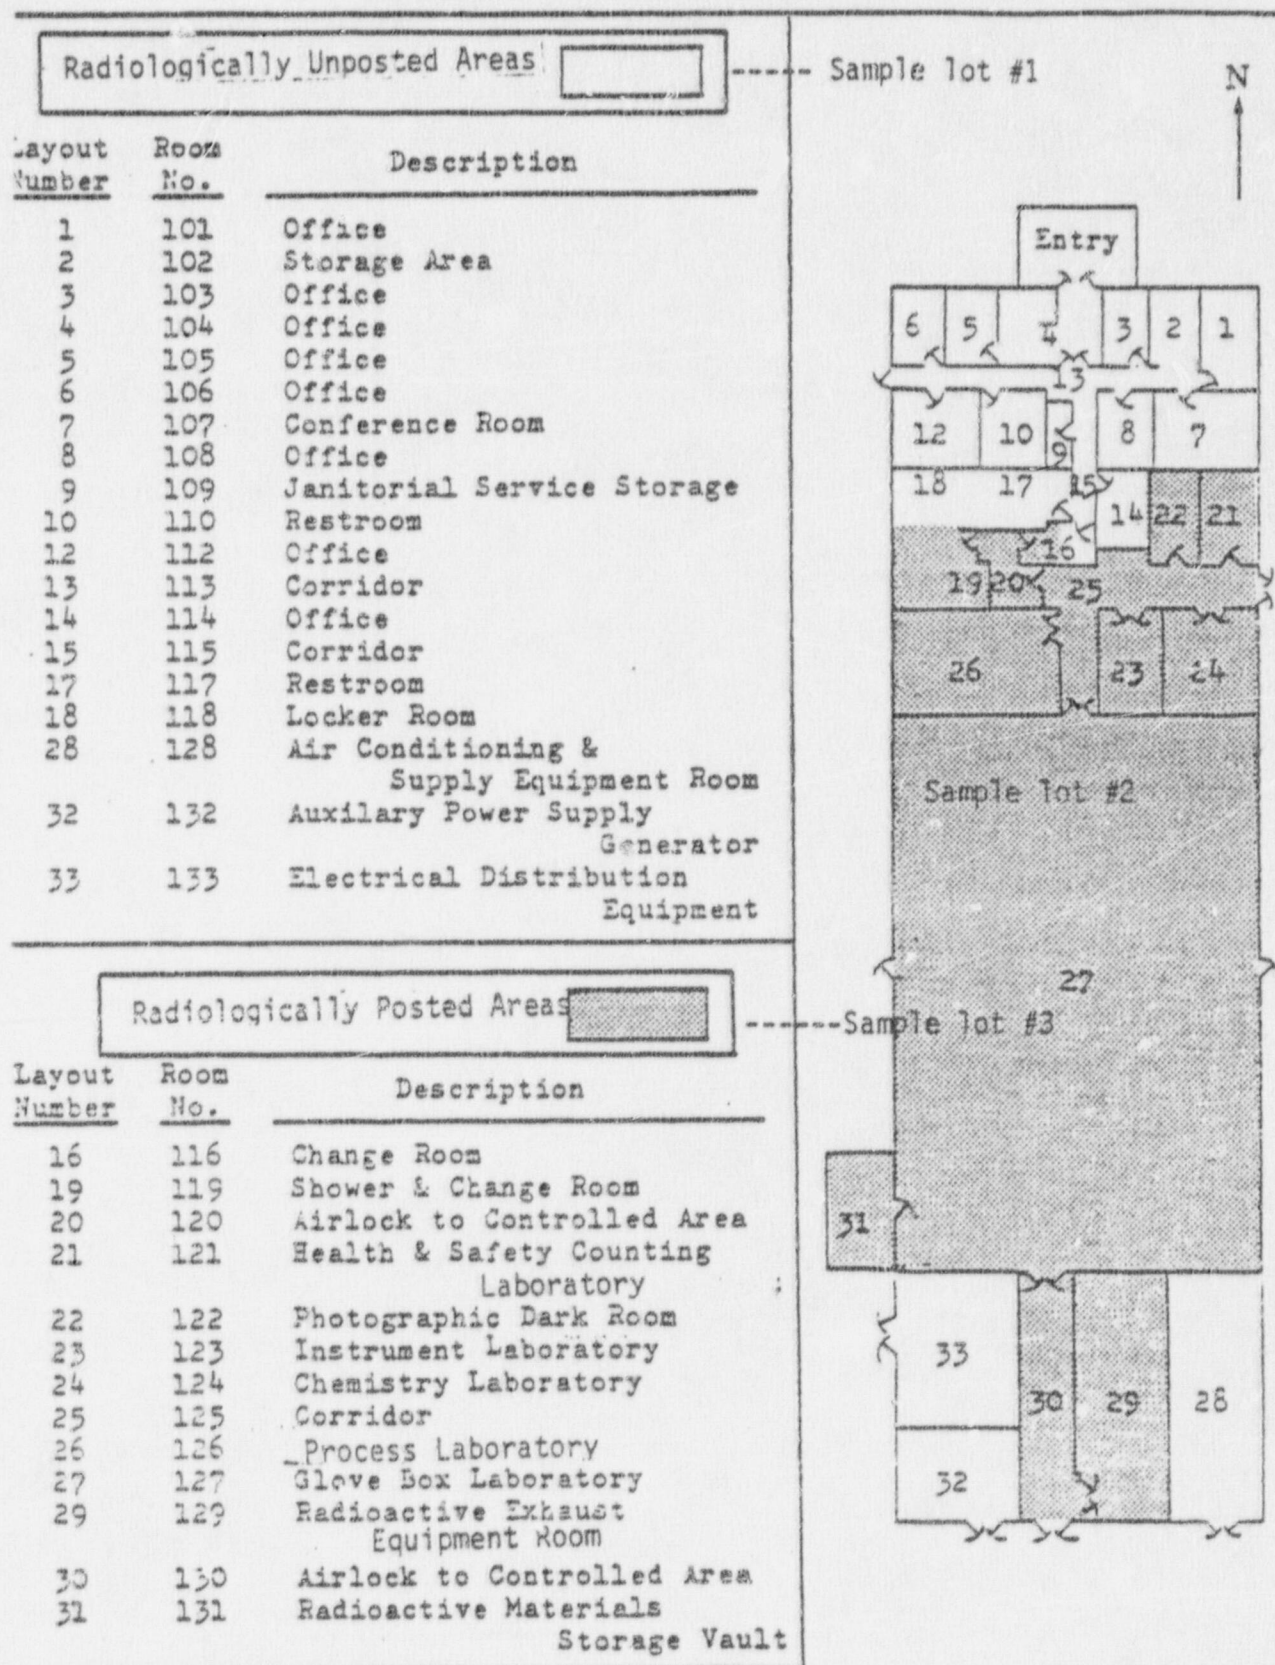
THE NNDF ARCHITECTURAL PLAN
